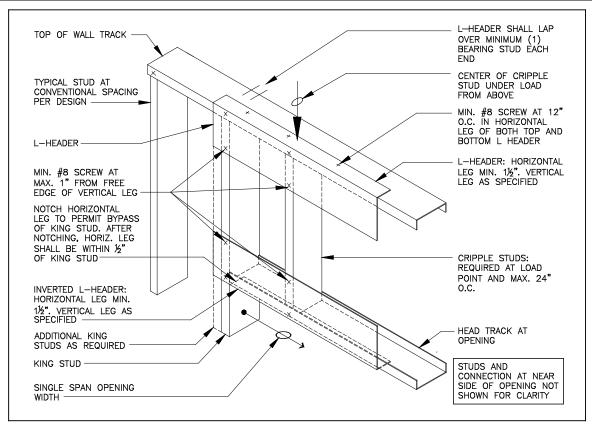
Inverted Single or Double L-Header Assembly (Single L-Header Shown)
